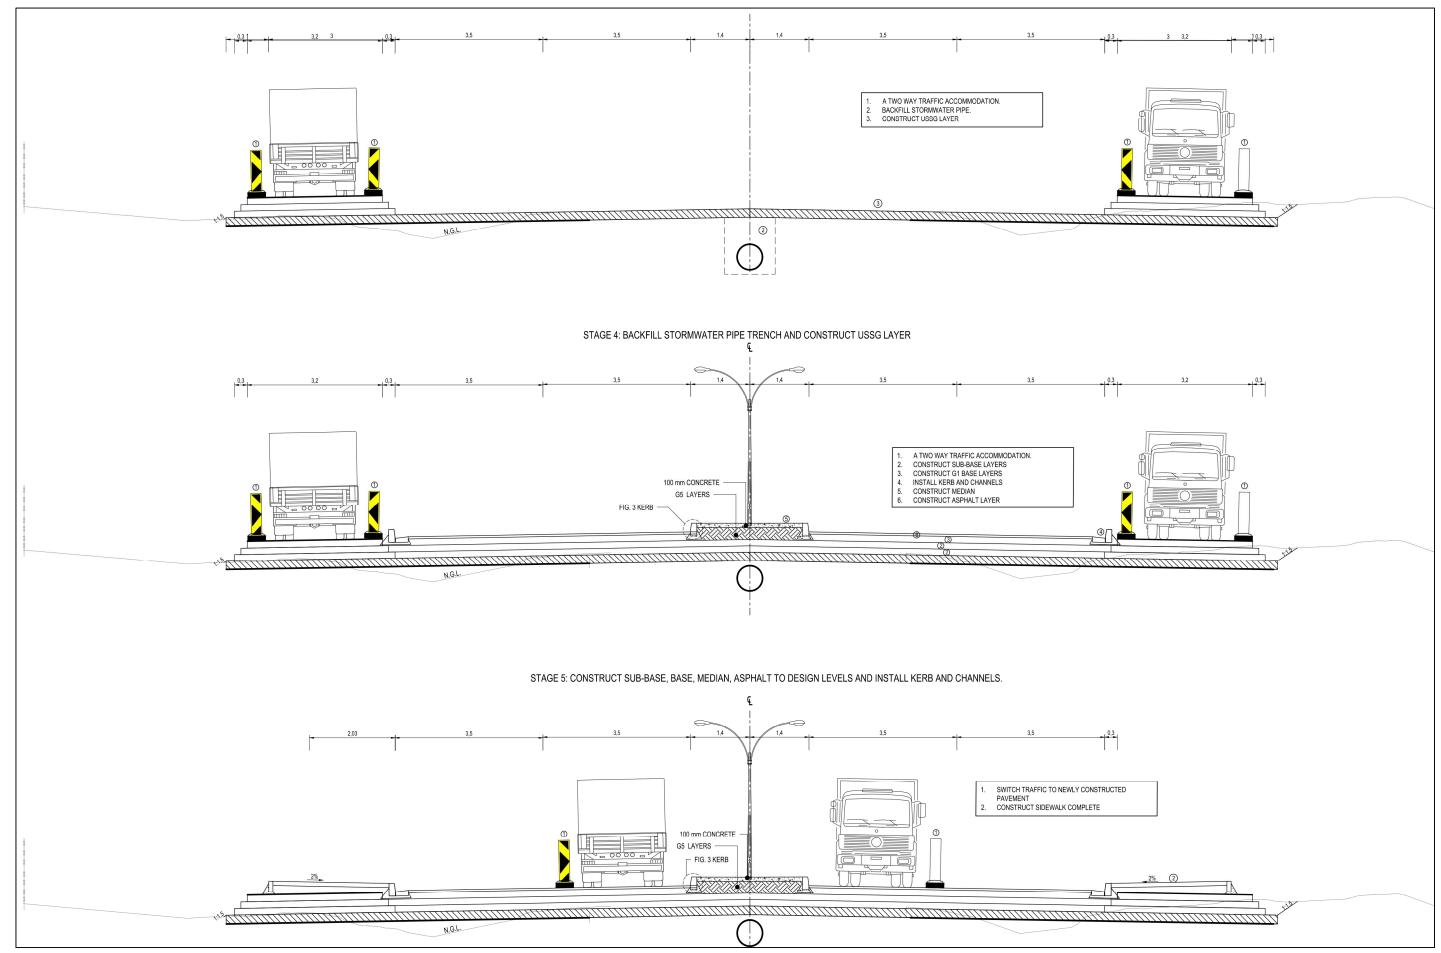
Constructing a Four lanes urban cross section with raised kerbs, median and sidewalks
